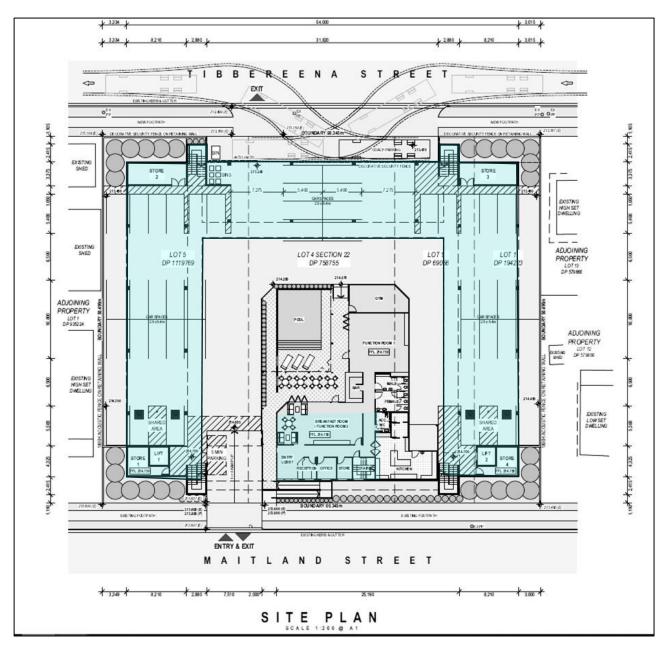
Proposed Site Plan/Ground Floor Plan (First/Second Floor footprint indicated in blue shading (Hill Lockart Architects, 2021)
